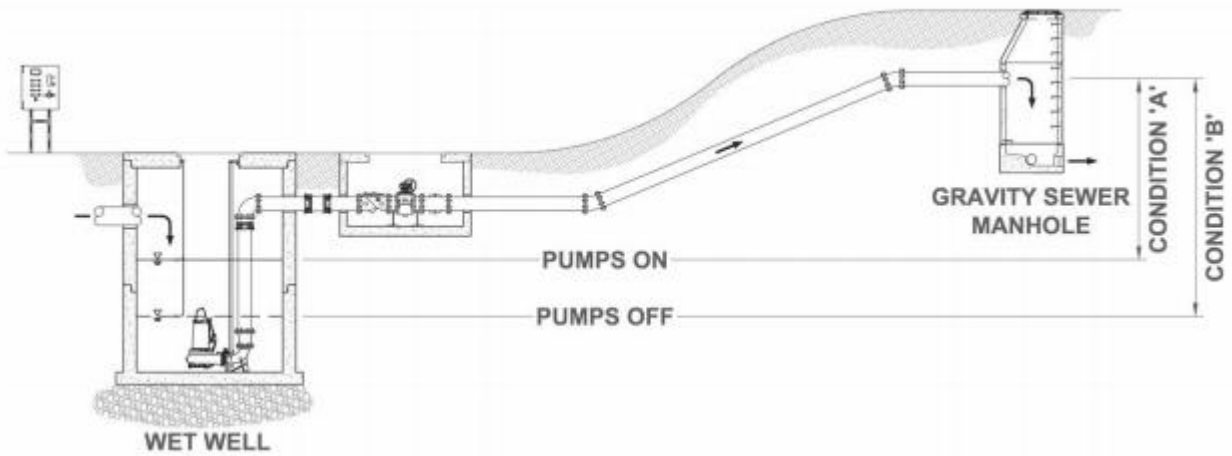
GENERAL SECTIONAL LAYOUT
